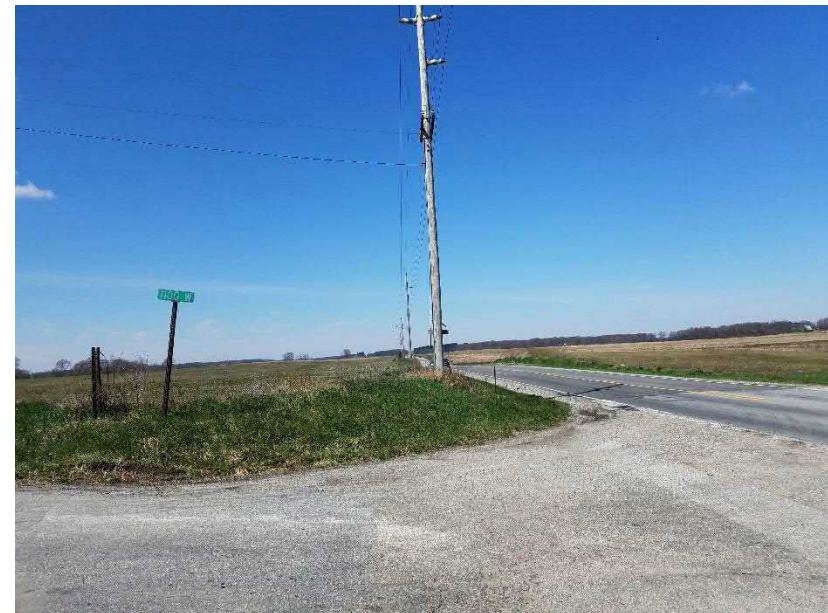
SR 14 and County Road 1100 West Intersection Facing East
